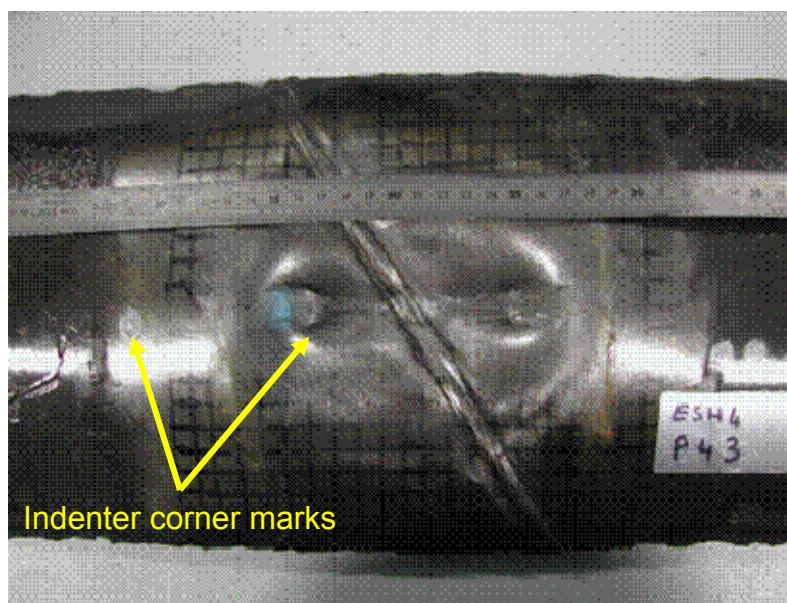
Gaz de France sample P43 containing a axially-elongated dent with a spiral weld (top view of outer pipe surface). Dent length is about 14cm. The indenter corner marks are clearly seen. These indenter marks lie at the base of two ‘double bumps’.
